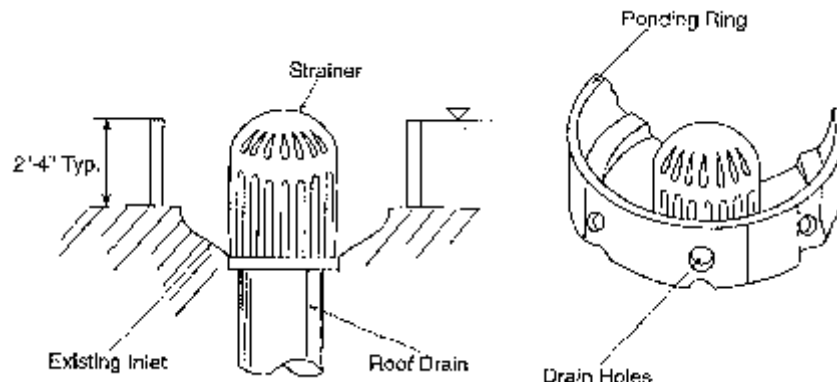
b Roof ponding rings. Source: Adapted from Tourbier, 1974.
